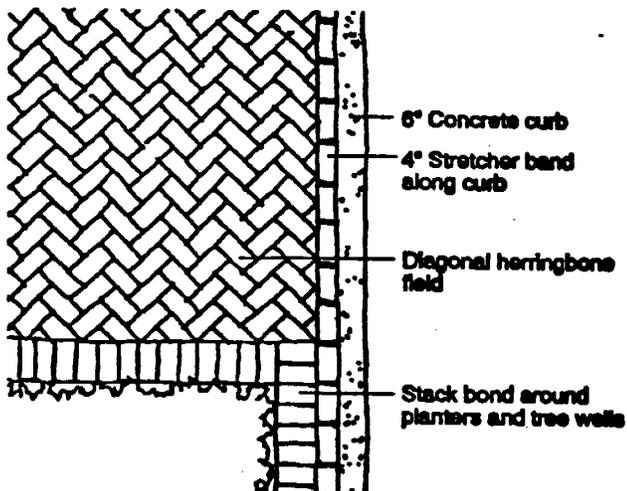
Ballenger Precinct Standard Sidewalk Paving
